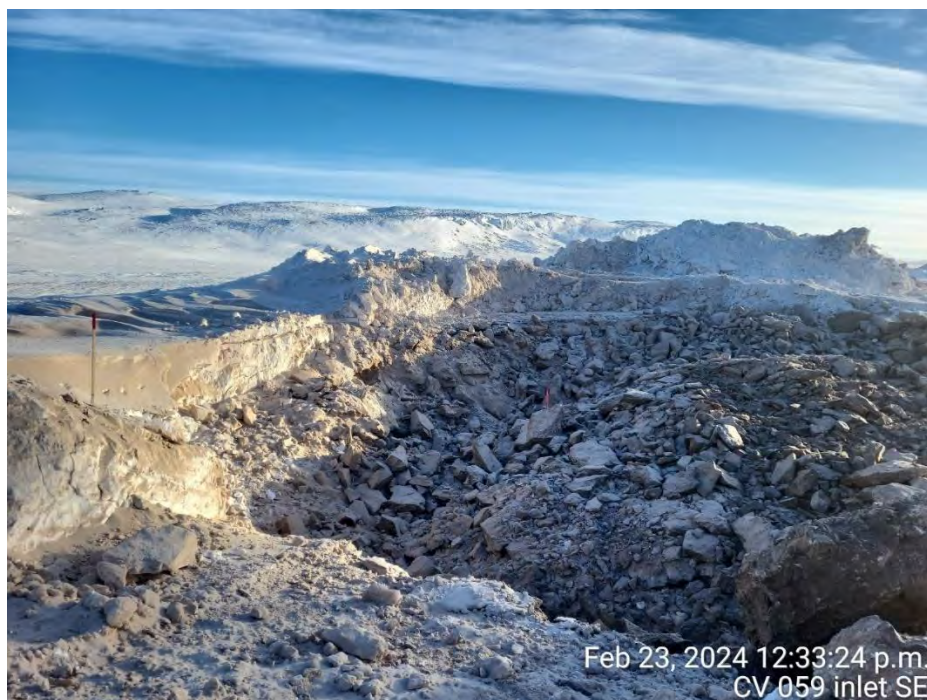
CV-059 looking southeast at the blasting excavation in the area of the culvert inlet (February 23, 2024)
